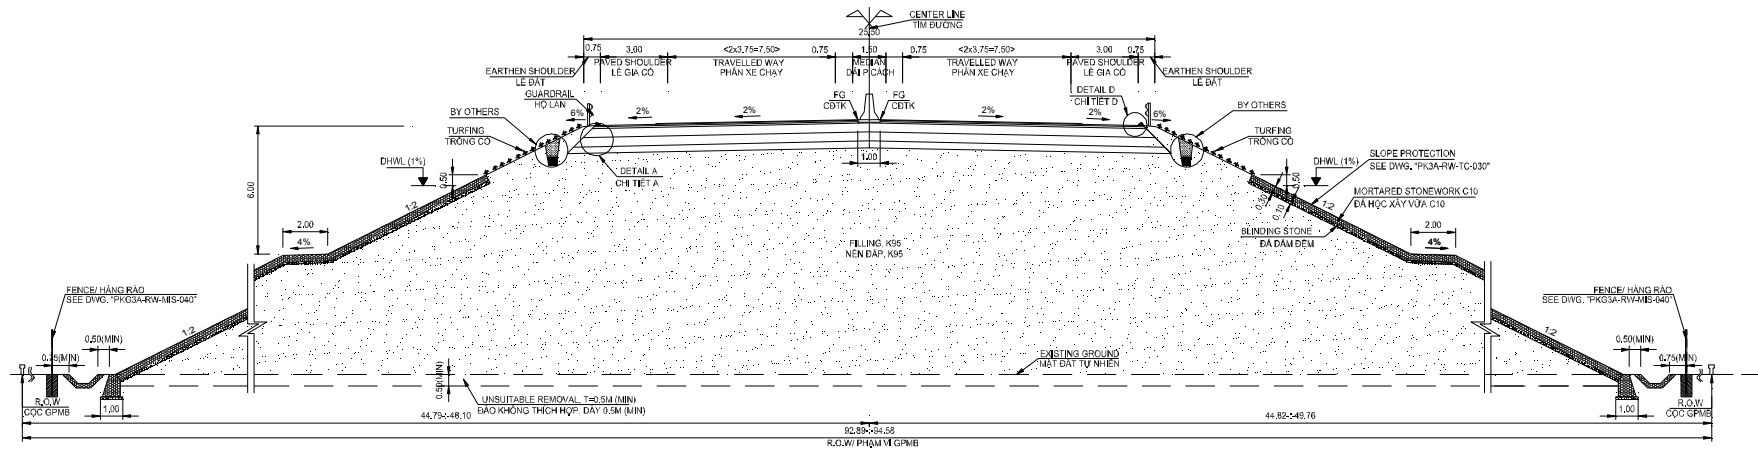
(d) Typical Cross Section of Embankment without Frontage Road (KM18+070.20-KM18+100)
